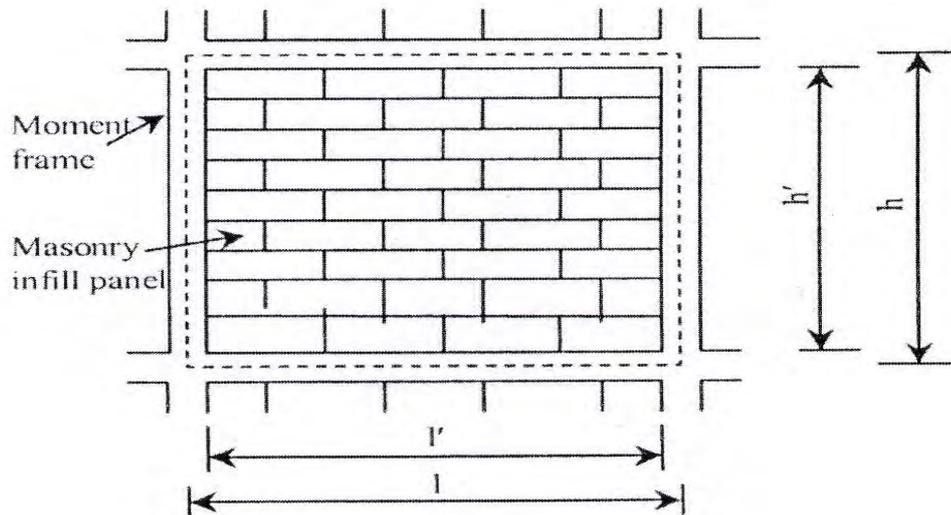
(a) Masonry infill frame in masonry infill panel frame (Madan et. al, 1997)
